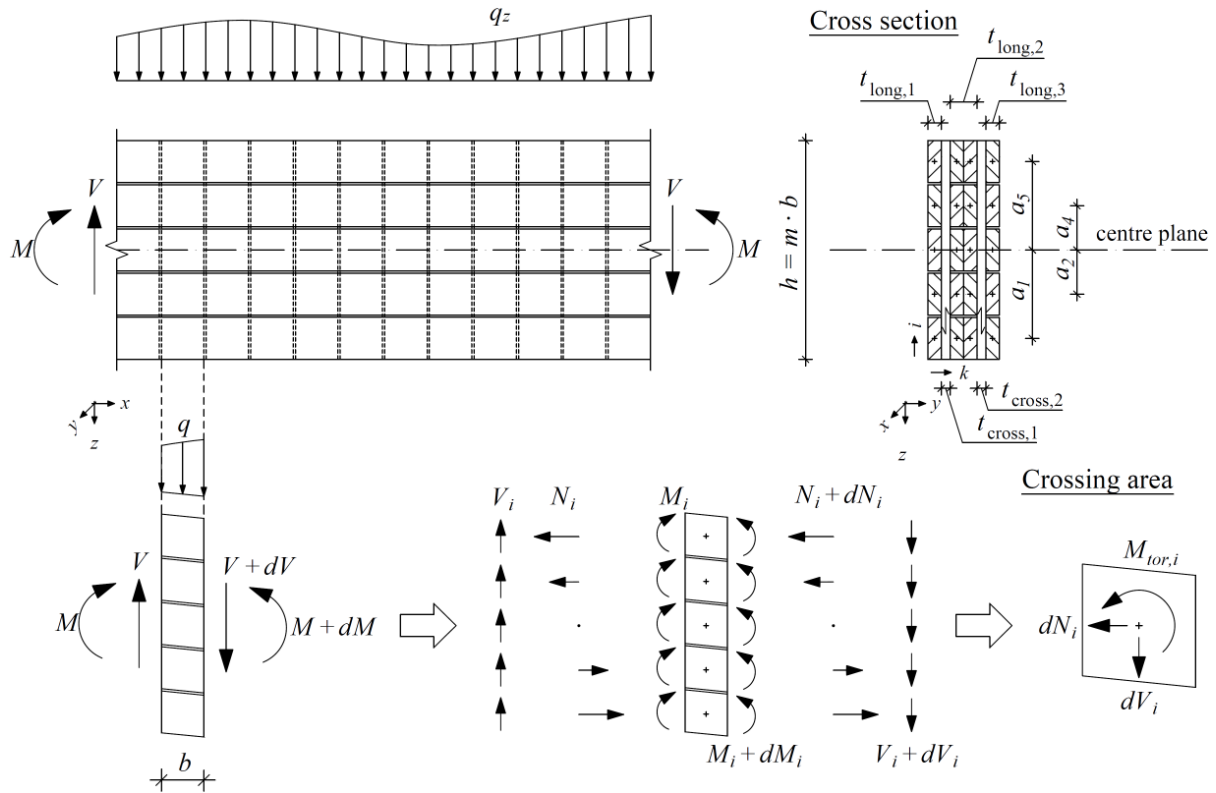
Side view and cross section of a four-layered CLT-beam loaded in plane (top) and internal forces in the beam, in individual lamellae and in the crossing areas (bottom, from left to right)
